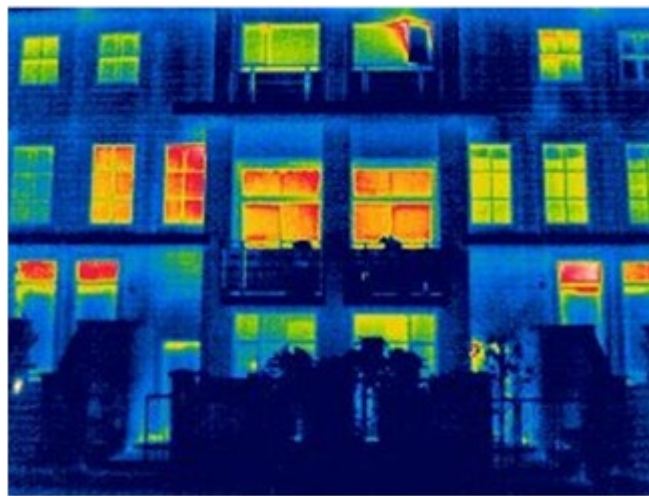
Infrared image of typically well-insulated wood-frame walls and less insulated windows with higher thermal bridging (courtesy of RDH Building Science).
